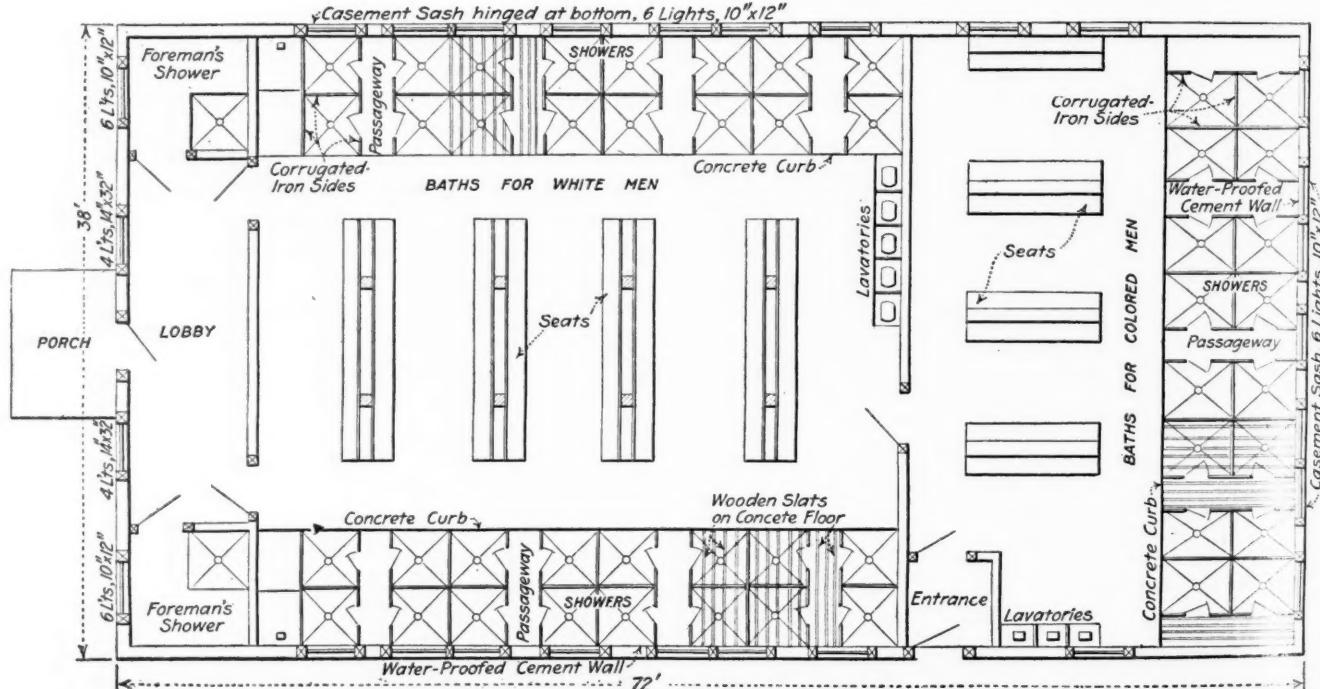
PLAN OF BATH HOUSE, SHOWING ARRANGEMENT OF SHOWERS, SEATS AND LAVATORIES
